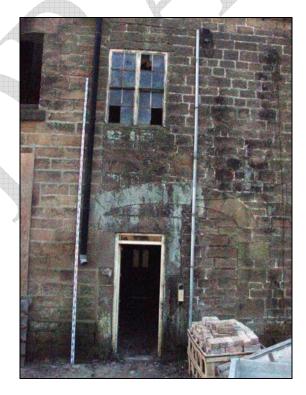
Photograph of the join between the mill and the house and the infilled archway on north-east façade of the house (facing south-west) (scale = 5m).
